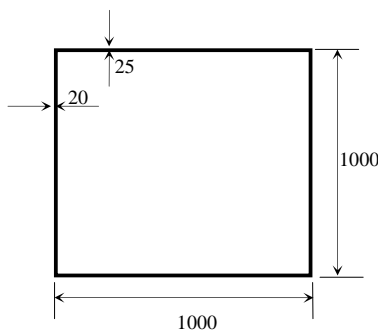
Dimensions (in mm) of Cross-section of Box Girder
